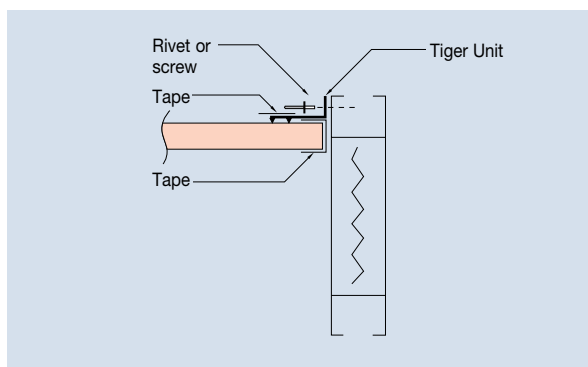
Use of the Tiger Unit with Flanged Components / Plant
